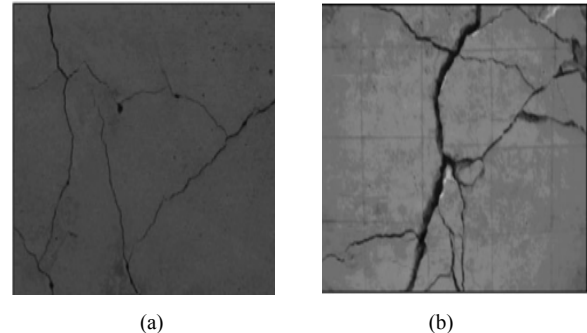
Types of Cracks: (a) Minute Cracks, (b) Wide Cracks [10]
